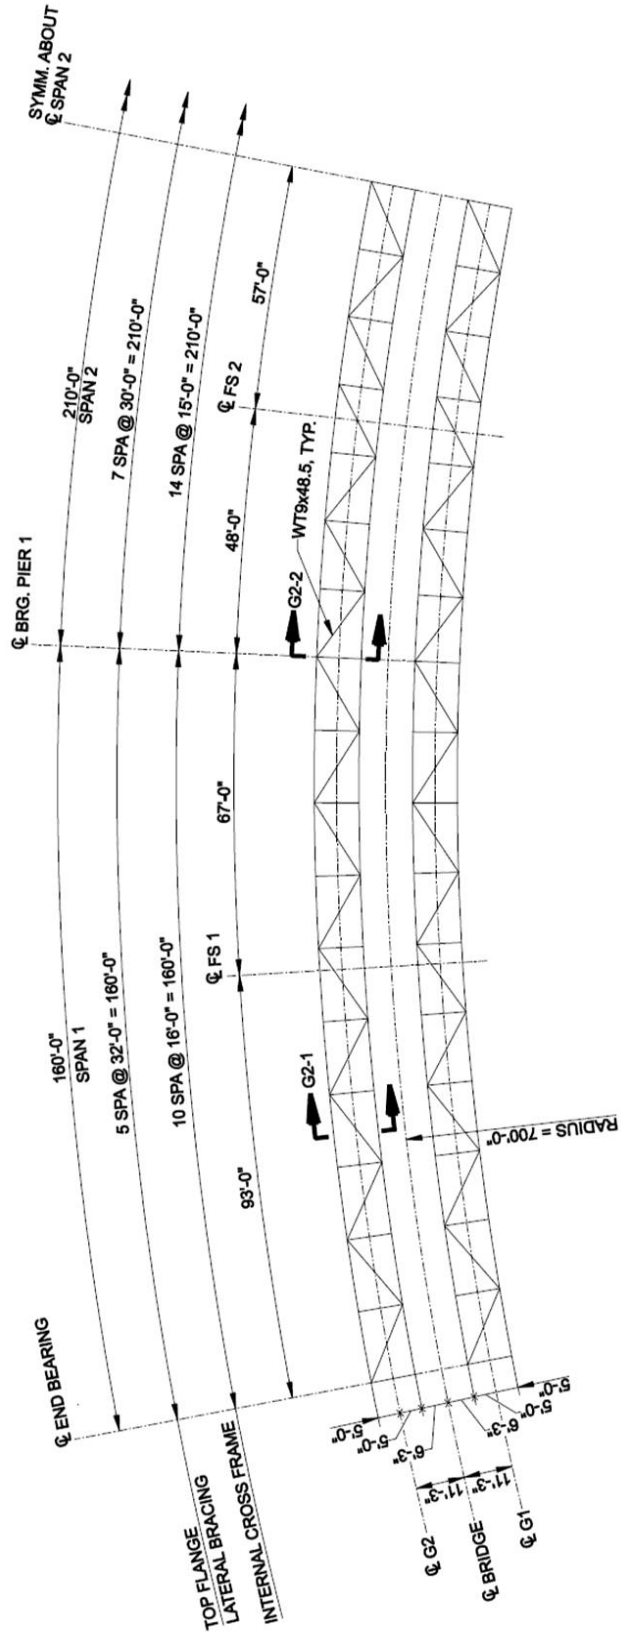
Framing Plan of the Example Tub Girder Bridge (all lengths shown are taken along the centerline of the bridge)
